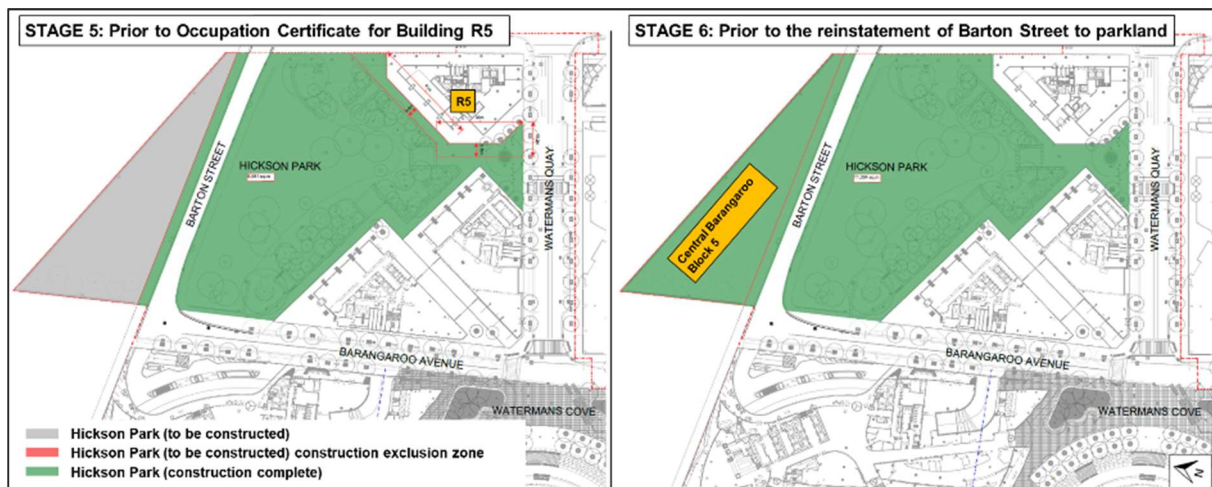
| Proposed Hickson Park construction Stages 5 and 6 (Base source: Proponent's EA)
